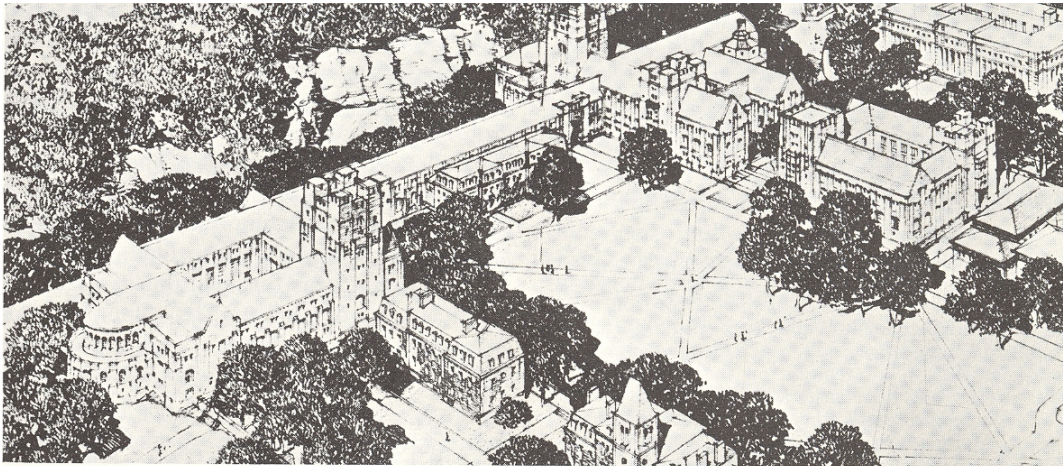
Sketch of ca. 1925 proposed College of Engineering complex.
